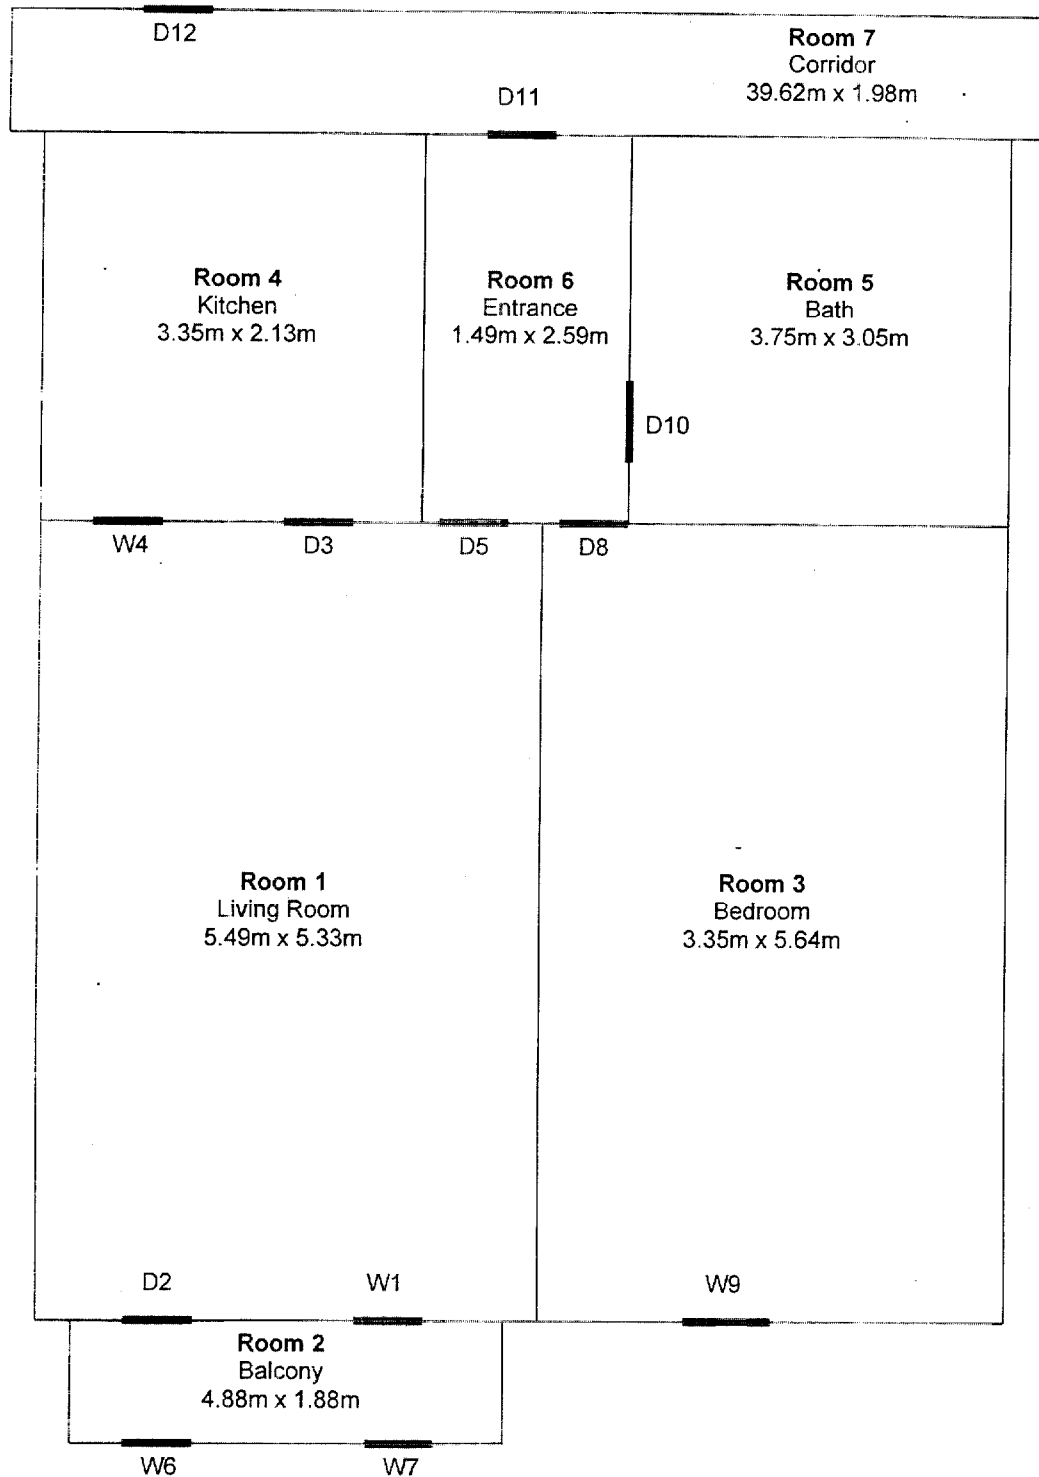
One Bedroom Apartment Layout (not to scale)
